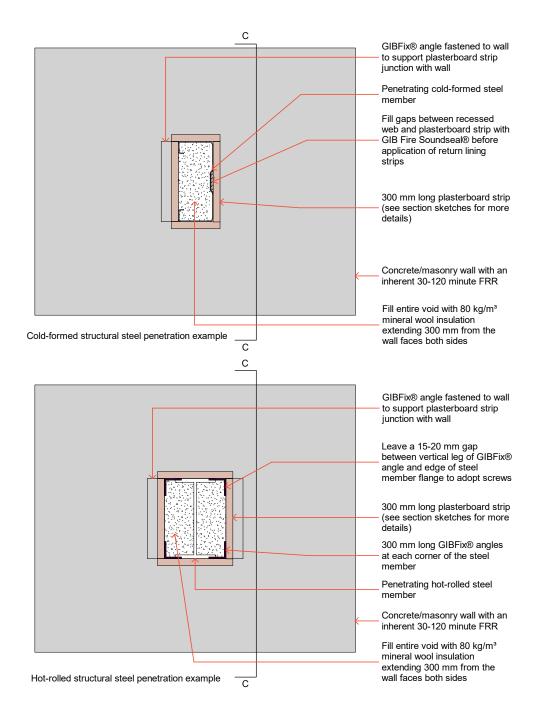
Hot-rolled or cold-formed structural steel penetrating concrete/masonry wall with an inherent 30 to 120-minute FRR
